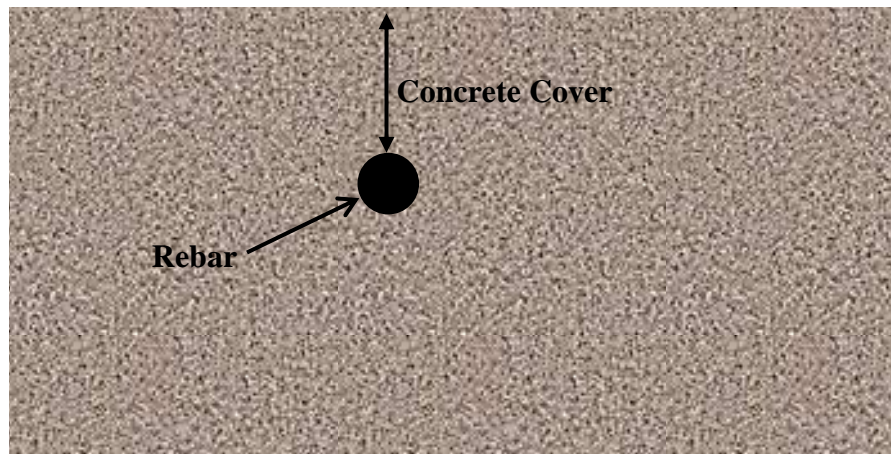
A diagram displaying the concrete cover and reinforcement position in concrete
